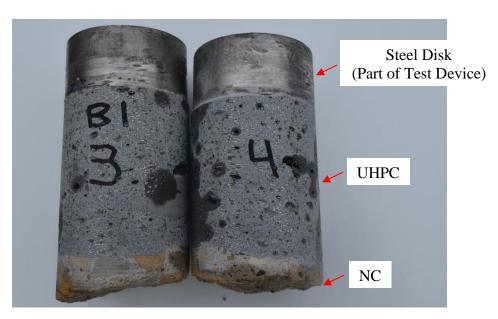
Typical failure mode from pull-off test on Mud Creek Bridge deck
